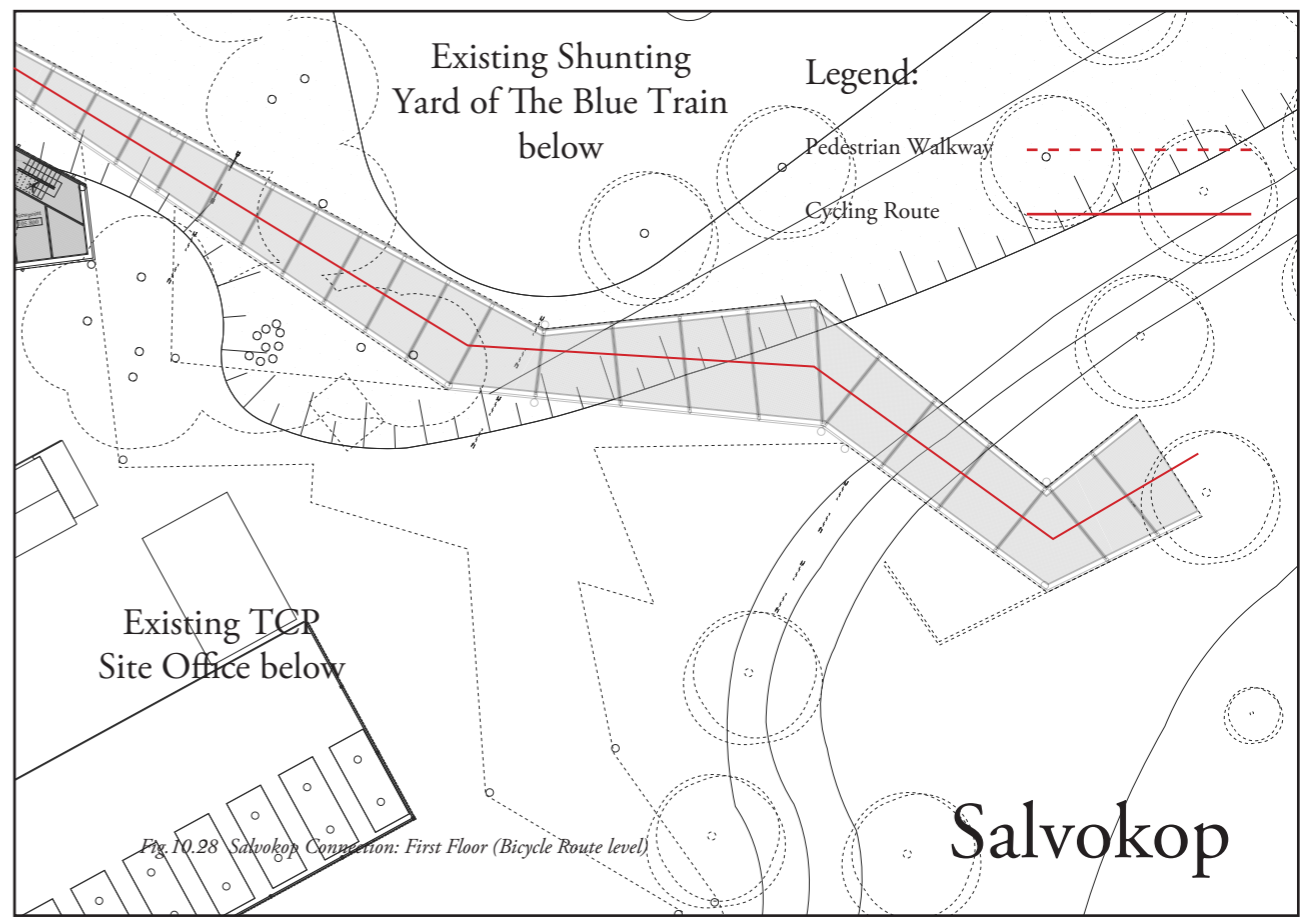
Salvokop Connection: First Floor (Bicycle Route level)
